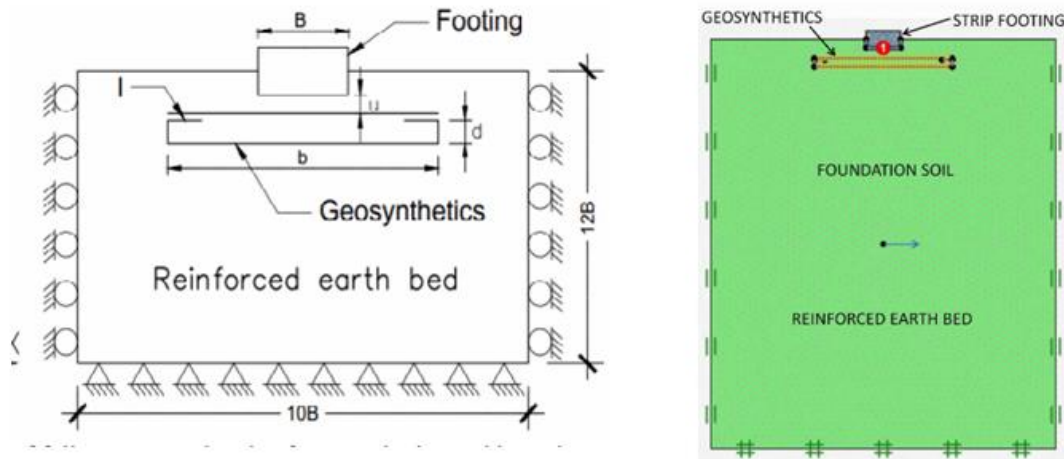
The Strip Footing Rested on Wraparound Geotextile-Reinforced Soil [52].
